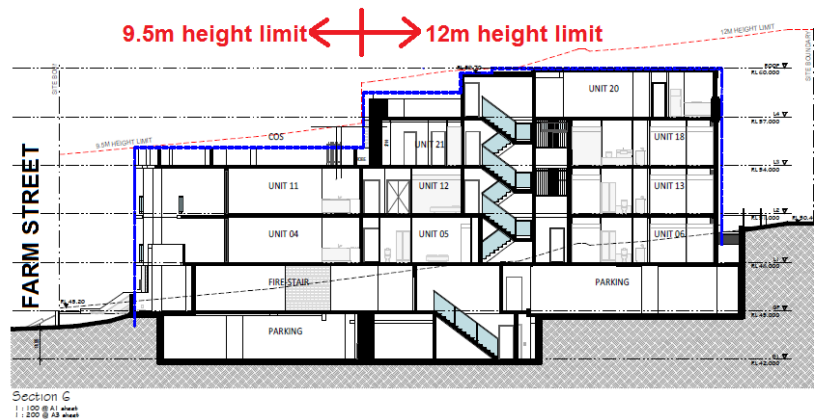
Section plan of proposed development indicating height control applying to the site.
